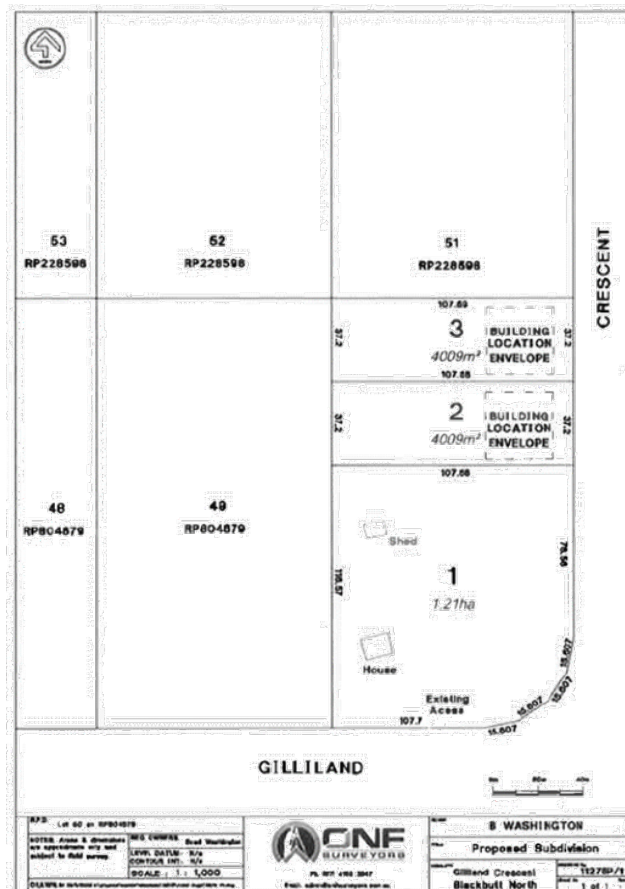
Proposed Subdivision Plan (ONF Surveyors).
